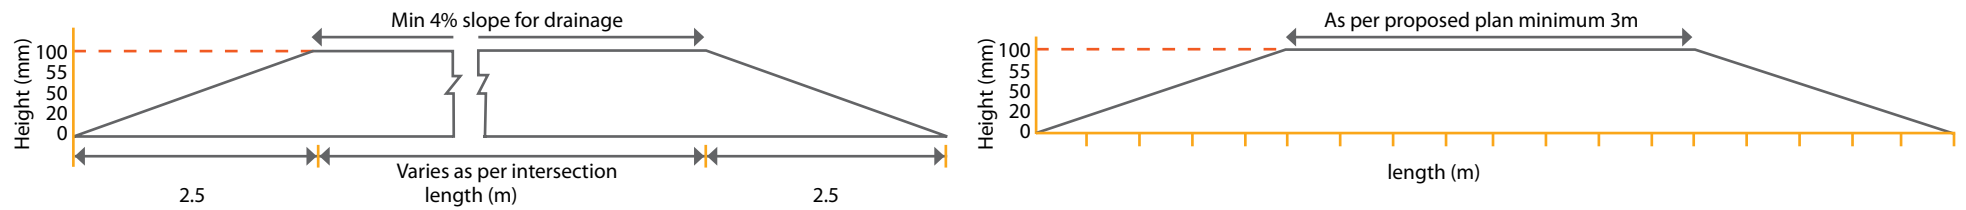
Conceptual drawings of a typical raised intersection and crossing; Danish street design standards
